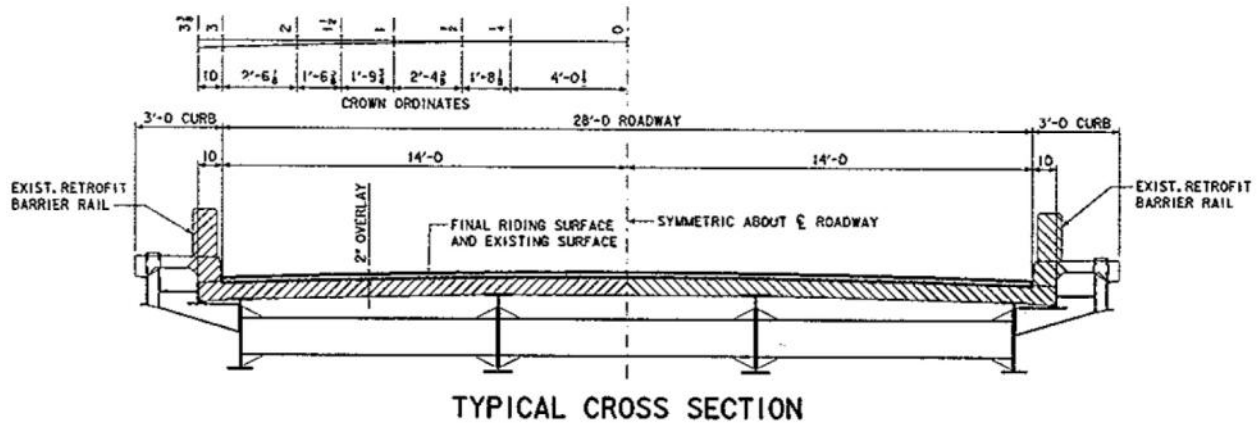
Cross-section of Deck O1, showing existing retrofit barrier rail and PC overlay.
